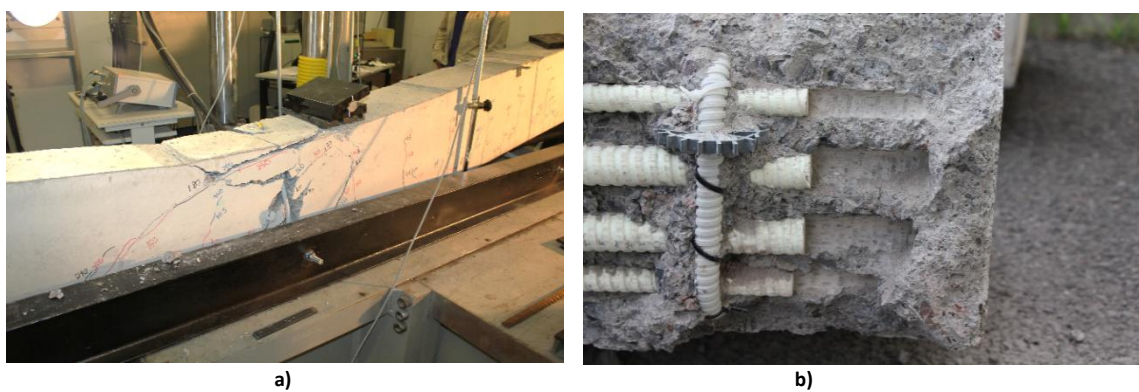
Shear failure due to the failure of the bond of the longitudinal reinforcement at support of BS250GFRP1 a) overall view; b) slip of the reinforcement at support
